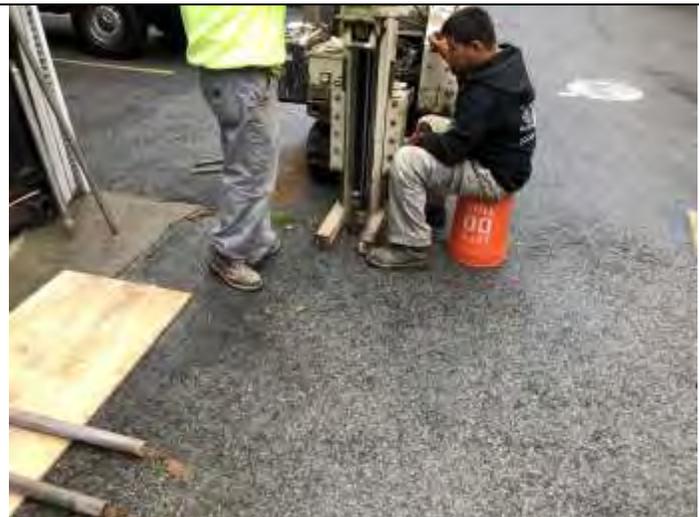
Soil Boring using Geoprobe Drill rig B-1
